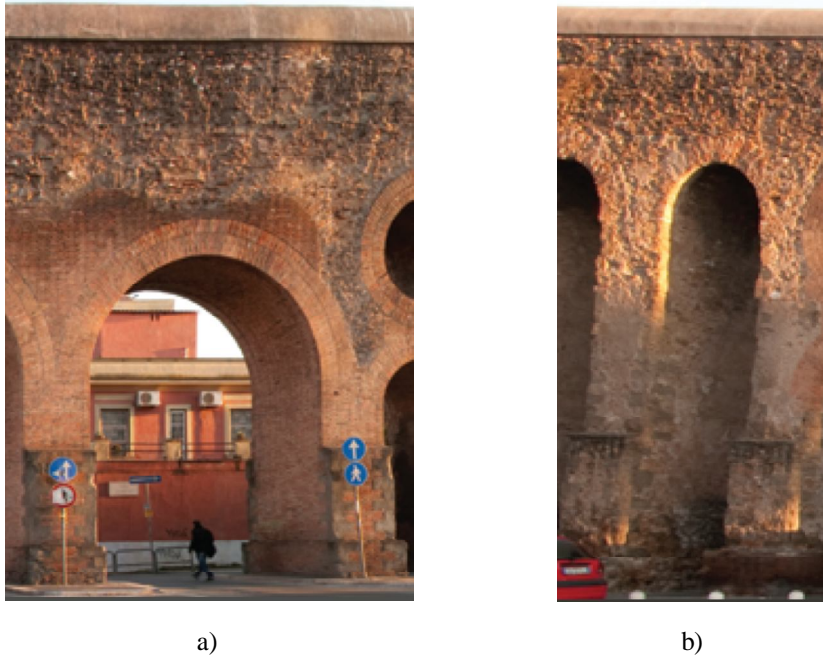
Details of brick (a) and tuff (b) masonry arches belonging to the Felice aqueduct, Sebastianelli (2011).
